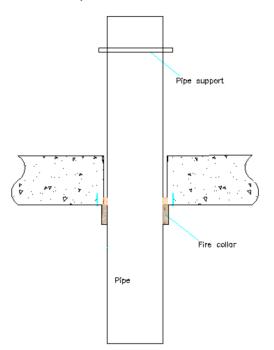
General arrangement of plastic pipes penetrating a 150mm thick concrete slab protected with Protecta FR Collar installed at the exposed side
